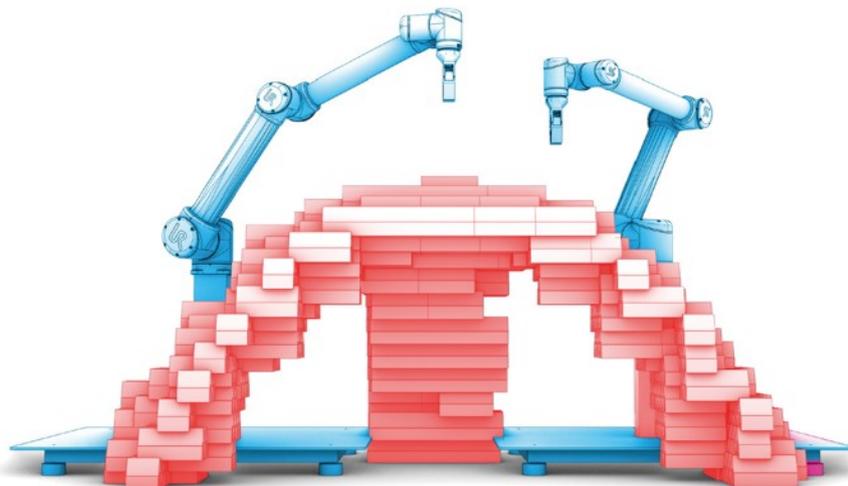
The designed volumetric shape before being tested against robotic assembly constraints
